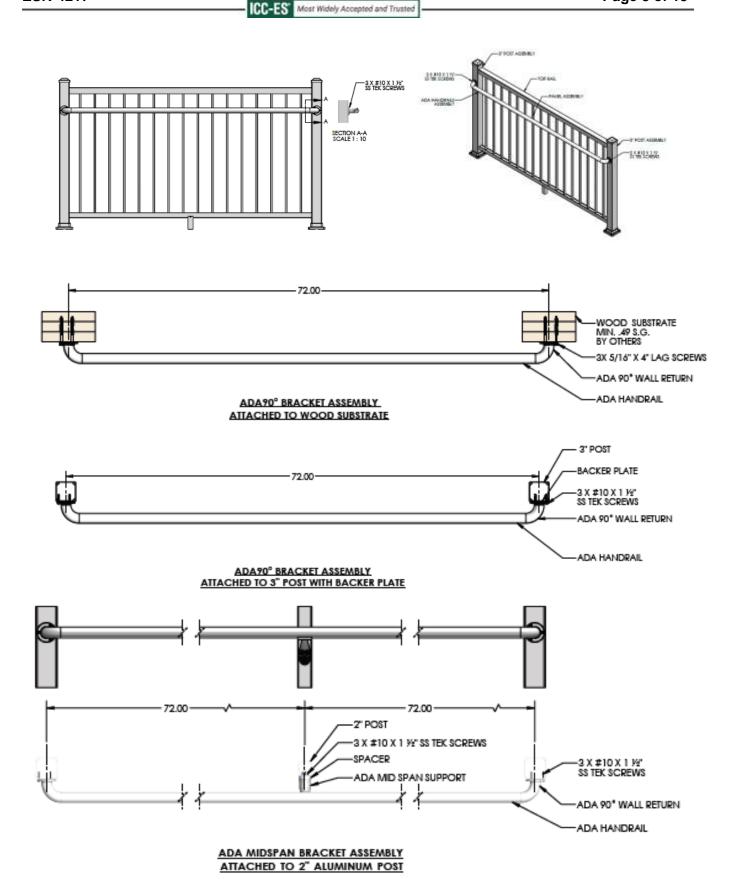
TYPICAL ADA HANDRAIL SYSTEM - COMPONENTS
